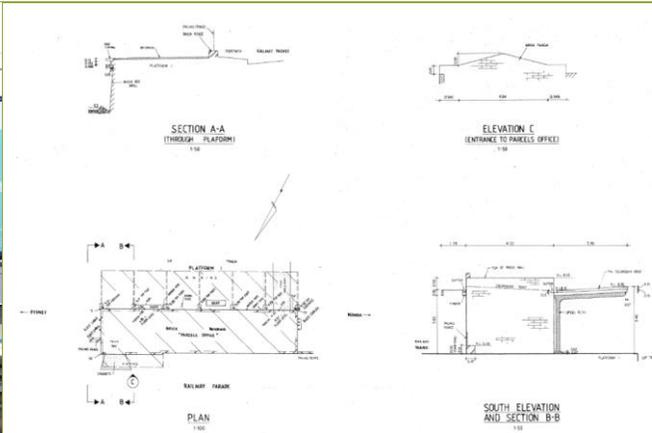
Plan of Platform 1 Parcels Office (Sydney Trains Plan Room, EMD CV0103364).
